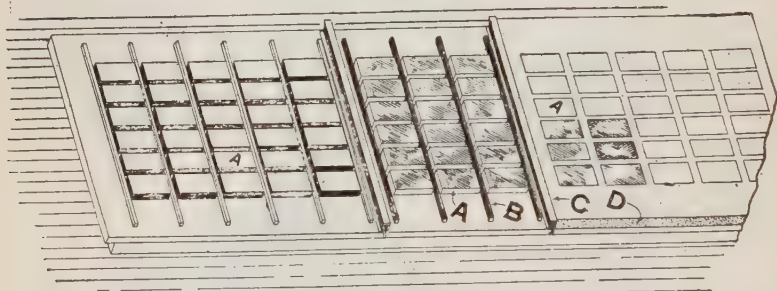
,056.—Reinforced slab skylight. The glass prisms are secured in the iron web by cement. A the glass, B reinforced iron or rod, C iron beam, D cement or concrete.
